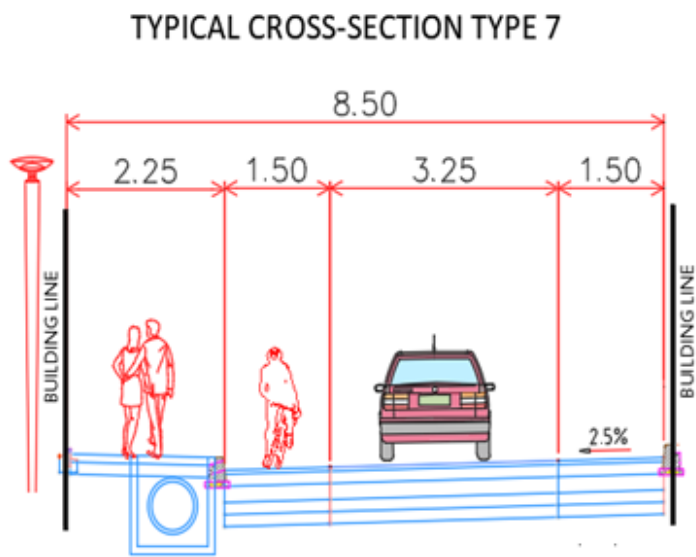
Typical Cross section Type 7 one-way Feeder Road
